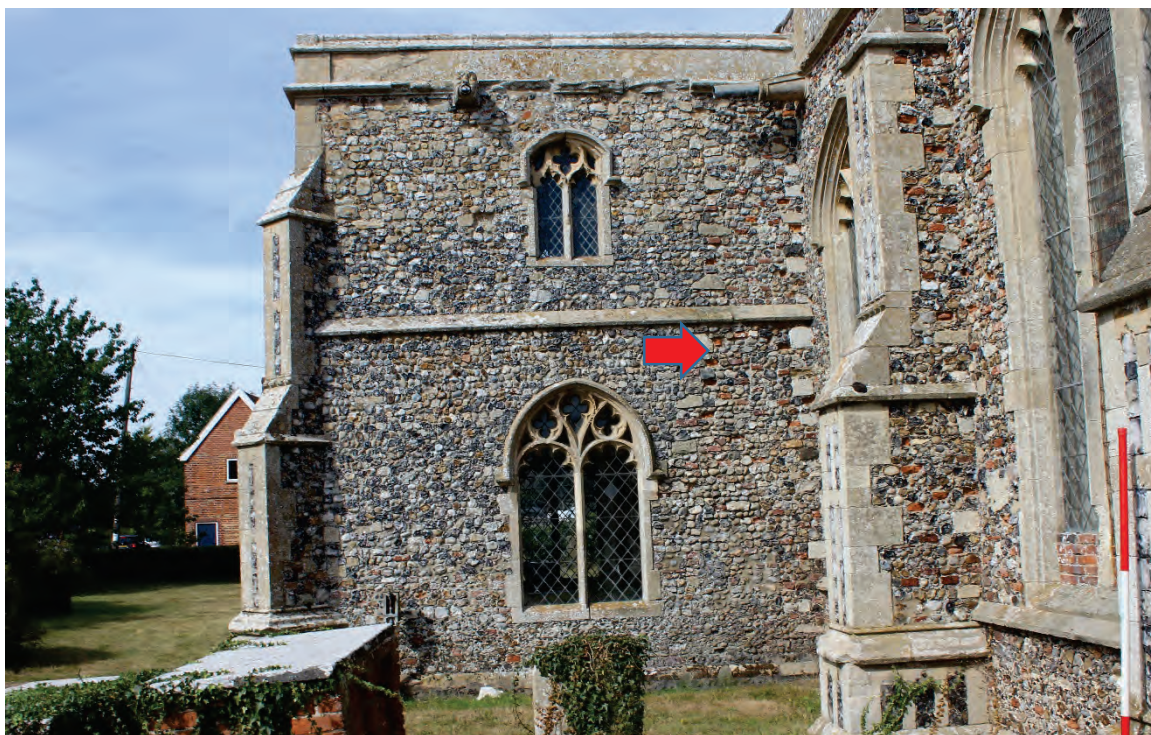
The south porch ground floor windows are in a decorated style and earlier than other windows in the church, the joint between the building of the porch and south aisle is arrowed.
